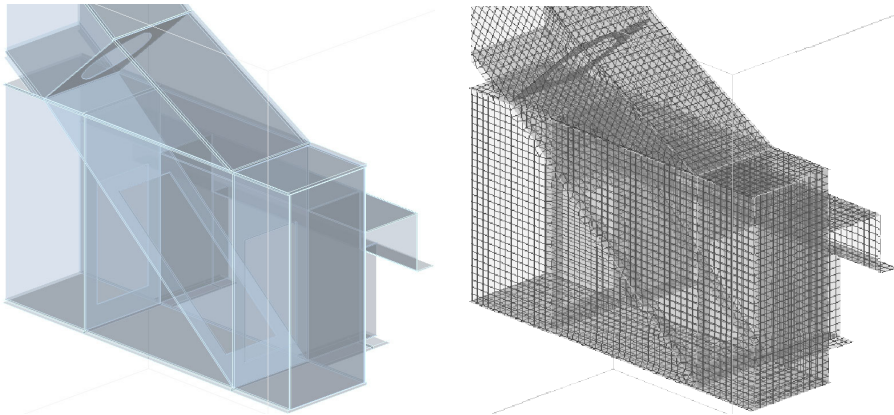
Detailed view on arch-to-girder connection of the bridge E in shell model alternative.
